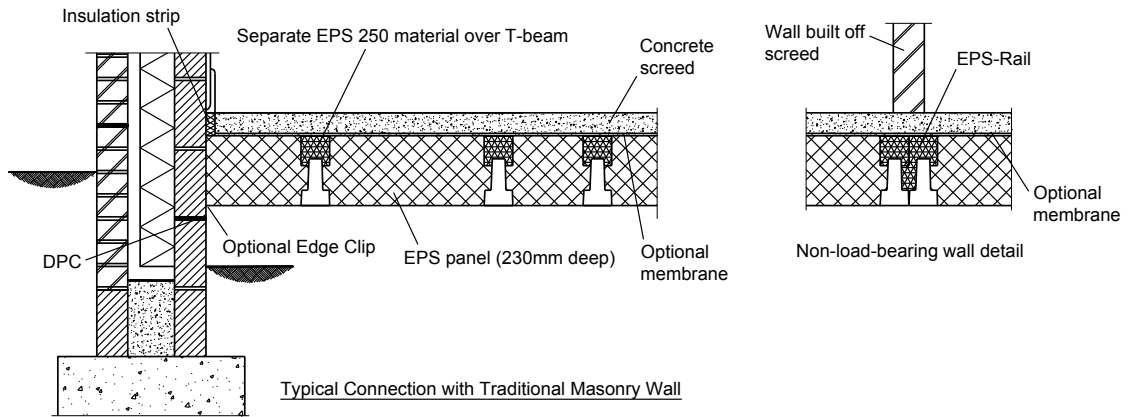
The Gdeck R1 EPS Panel System – GT detail 18 Floor/Wall Junction – depth 180 mm
